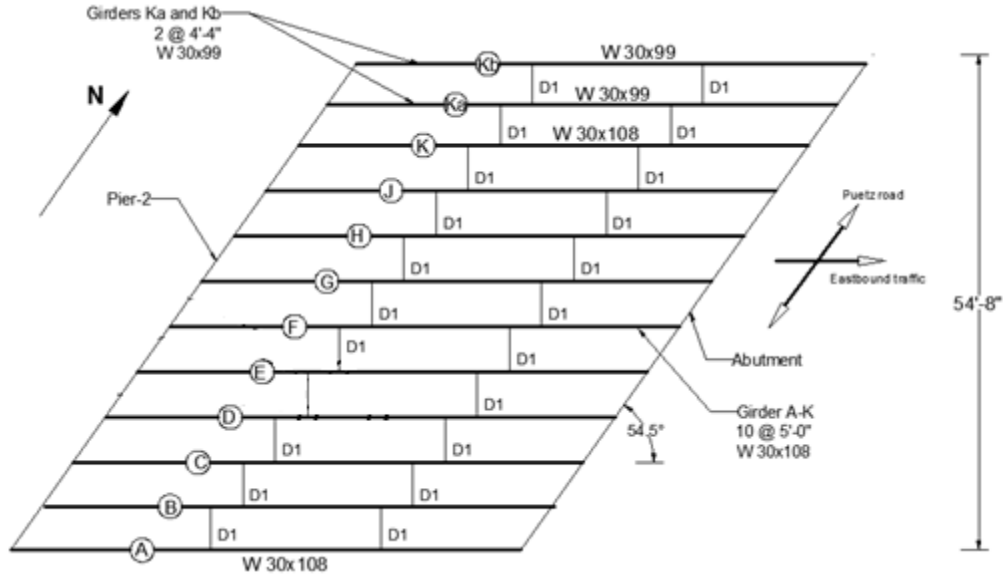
Girder and diaphragm layout of the EB bridge span 3
